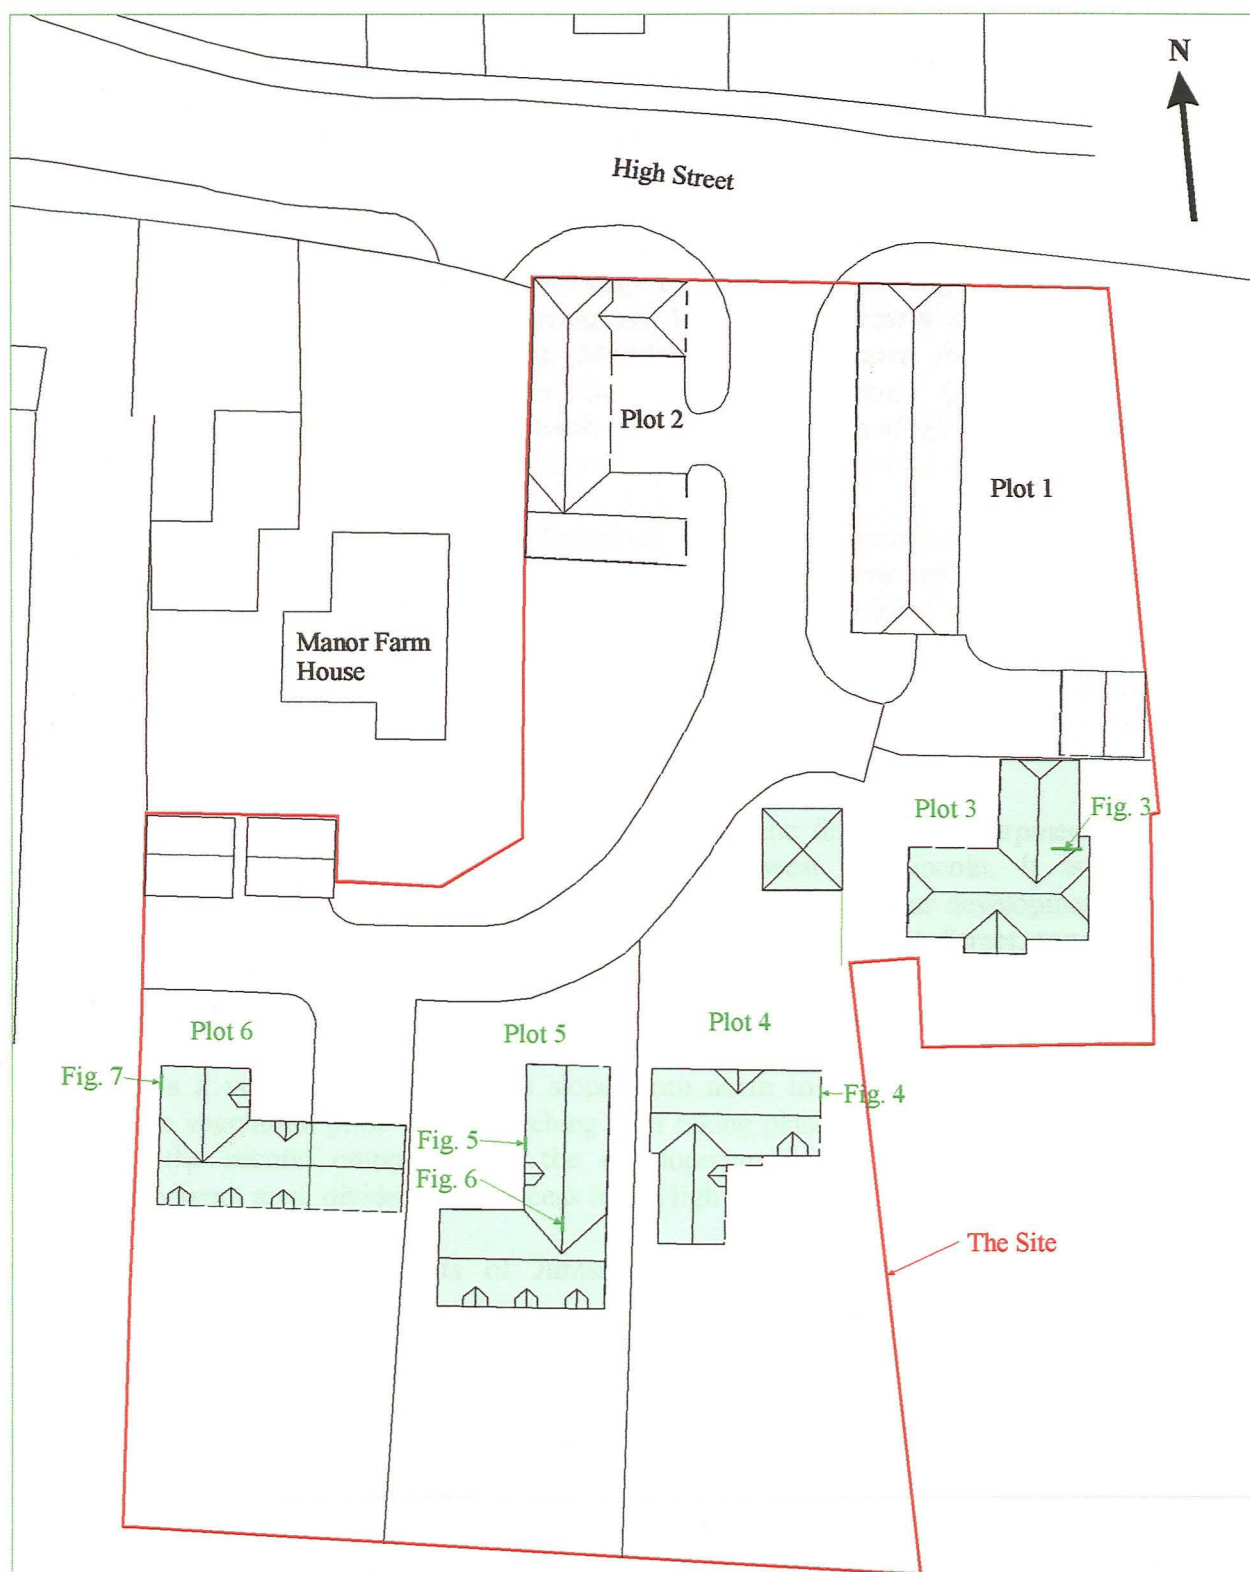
Development plan, showing the site boundary outlined in red. Monitored house plots and drawn sections are shown in green (scale 1:500)
